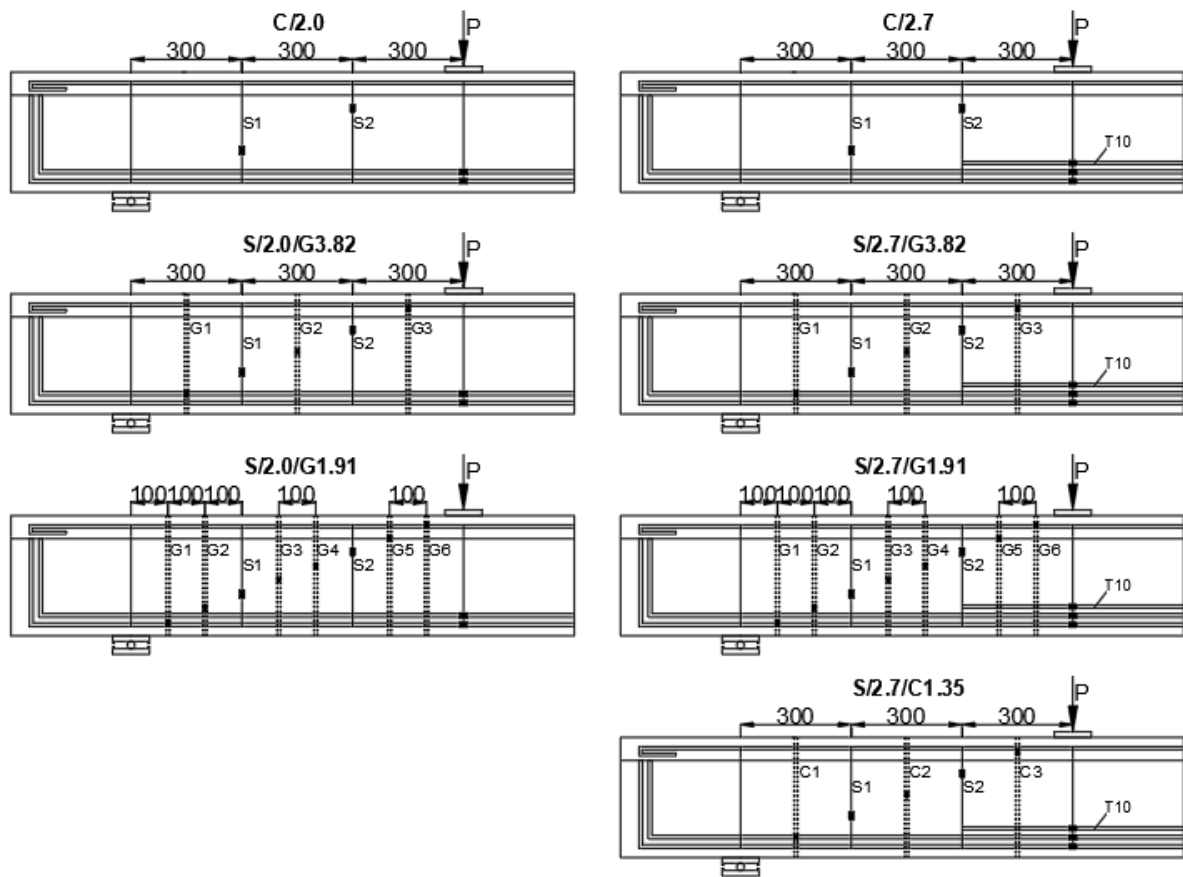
Spacing of steel and FRP shear reinforcement (dimensions in millimetres)
